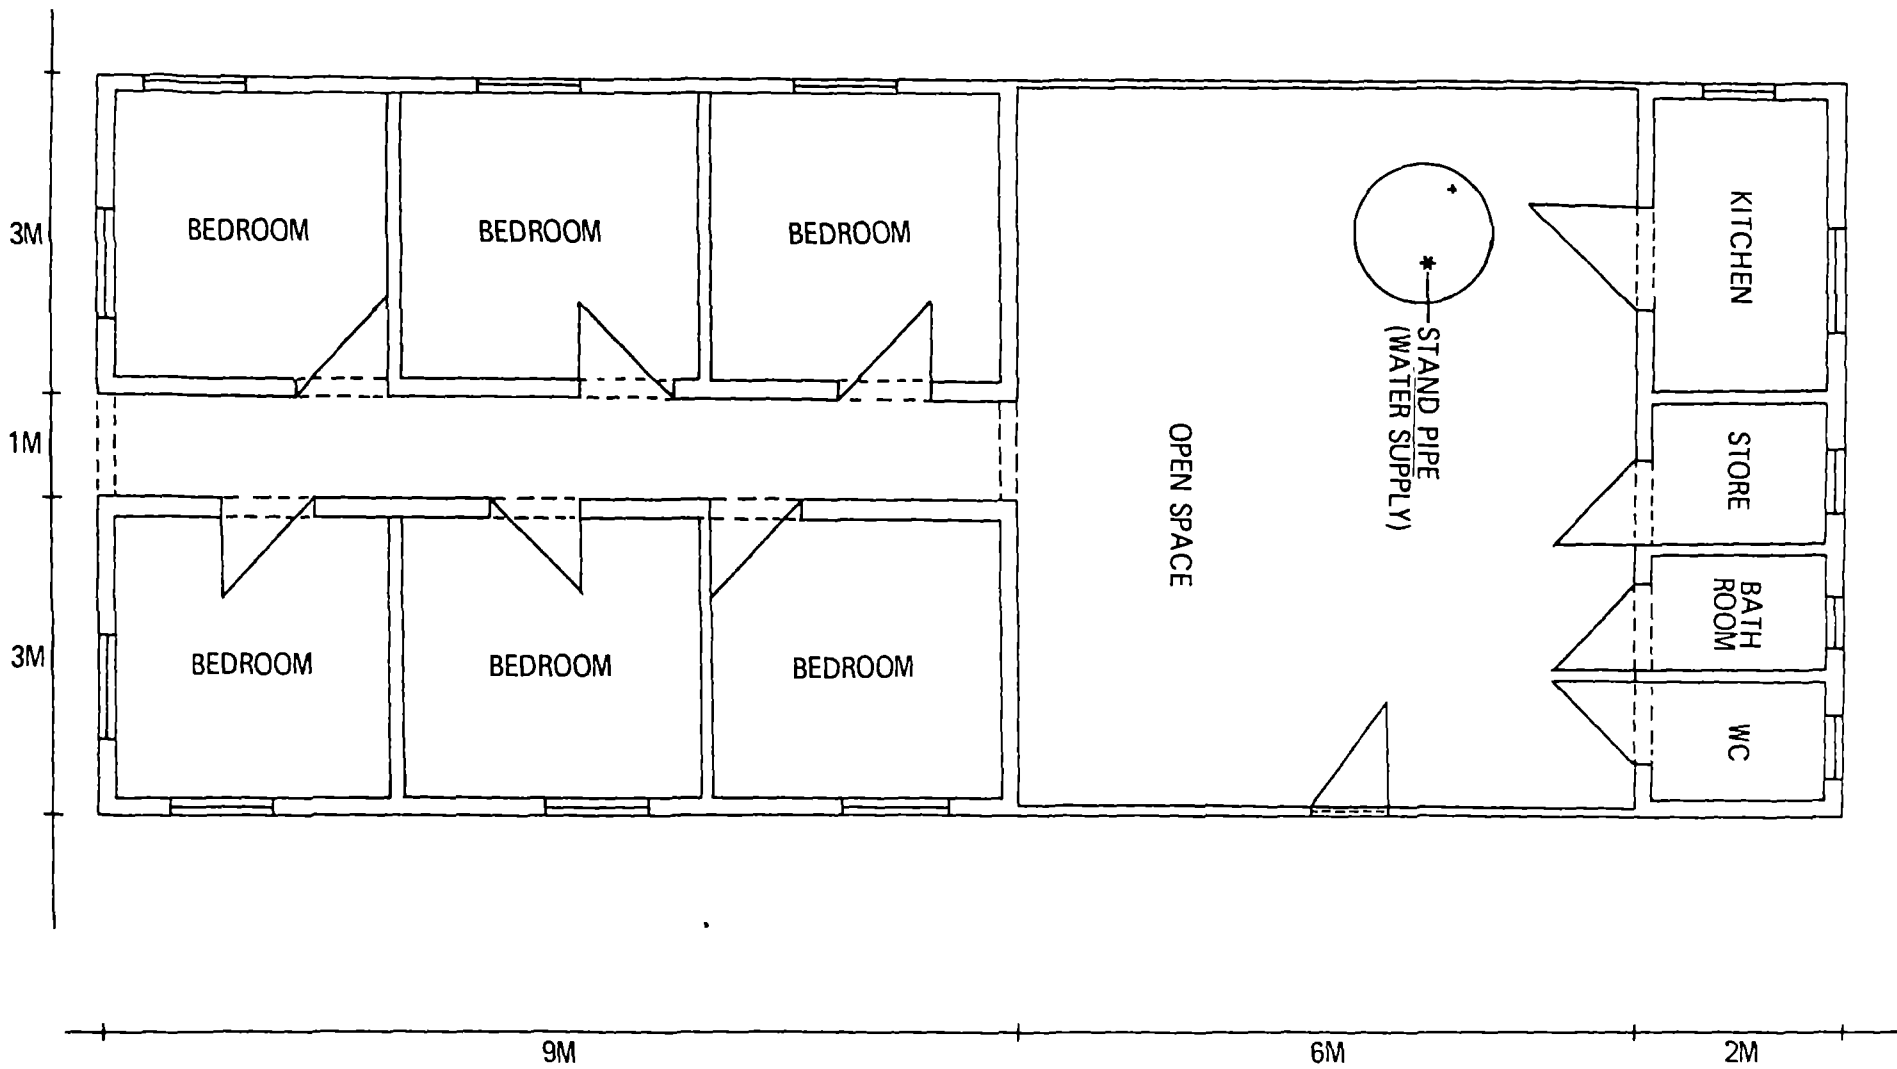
A TYPICAL SWAHILI HOUSE PLAN
